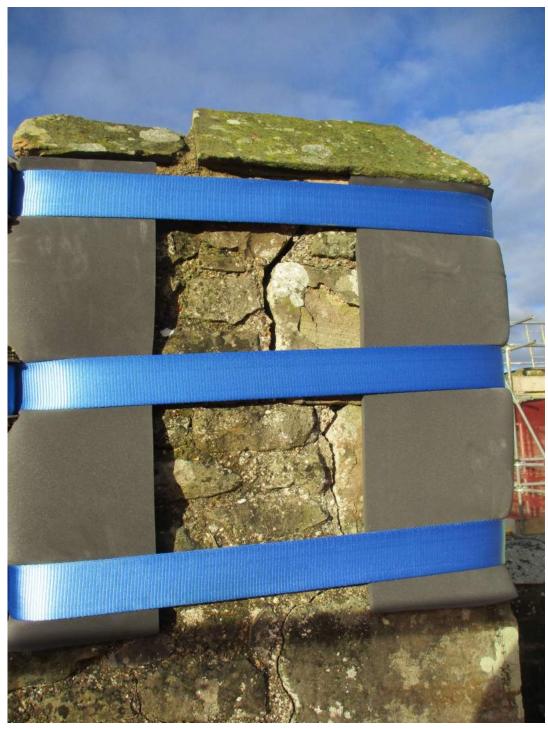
Crack visible in eastern elevation under temporary restraints
